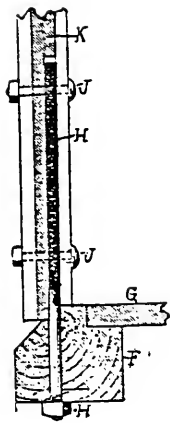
Sectional View Showing Construction of Sill and Fastening of Grooved Stud.
